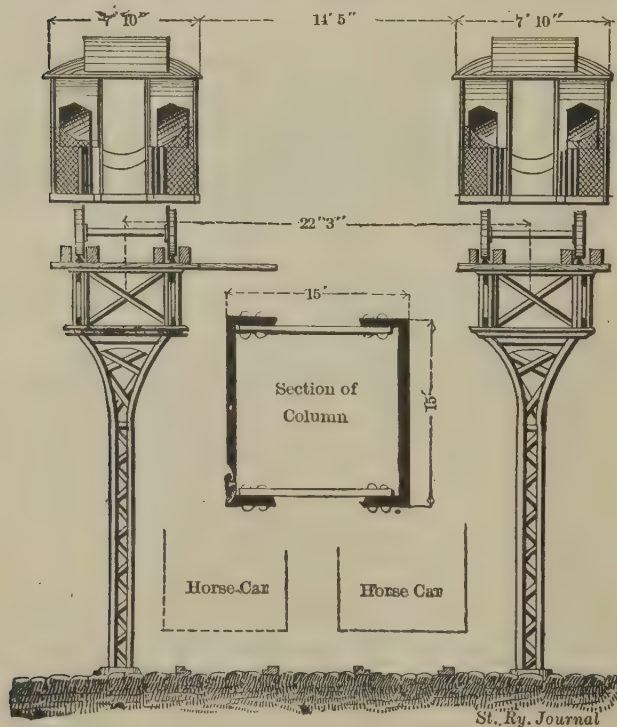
MANHATTAN ELEVATED—BOWERY.
